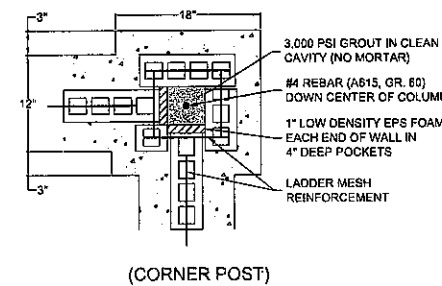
DETAIL E - INTERACTION BETWEEN EXISTING AND PROPOSED PRIVACY WALL
